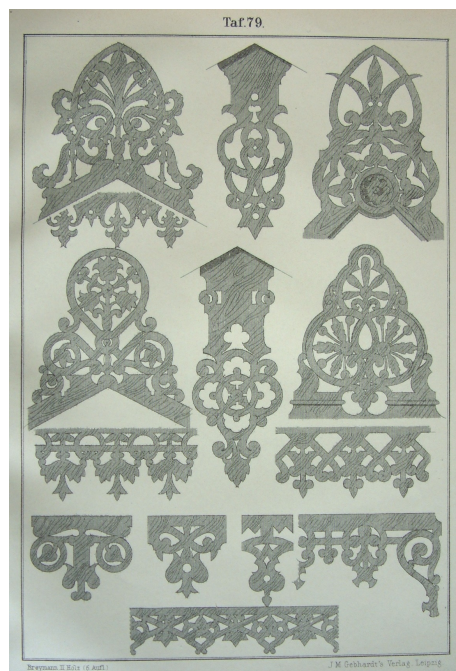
Whip-saw for jig-sawed boards, in 1870.
